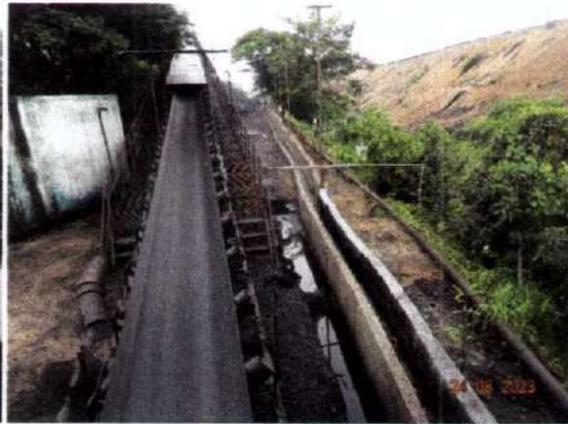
Photo of tanks walls slightly increased. Photo 26 : Photo of concrete drain in between project and Sonadubi river.
